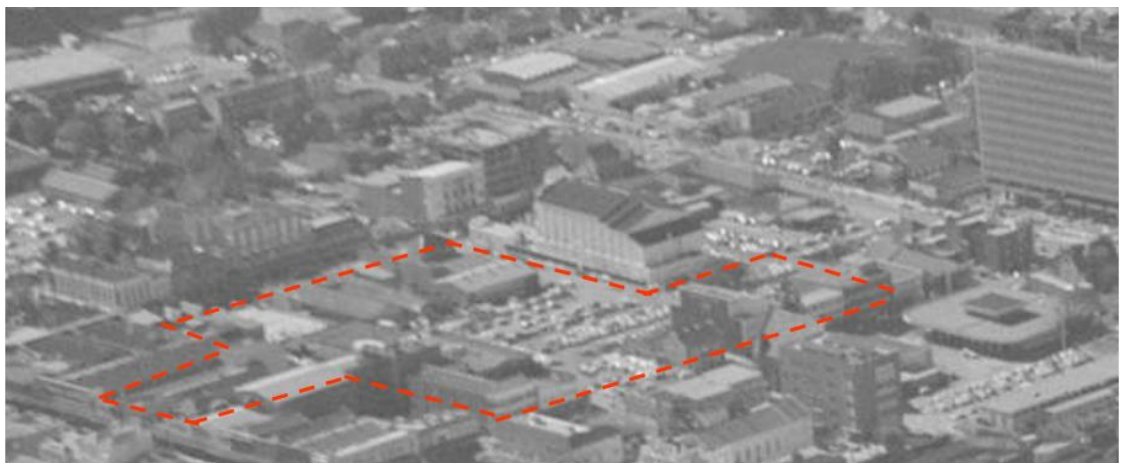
Detail of aerial view of Parramatta, 1970, showing the approximate construction site in red¹⁵
